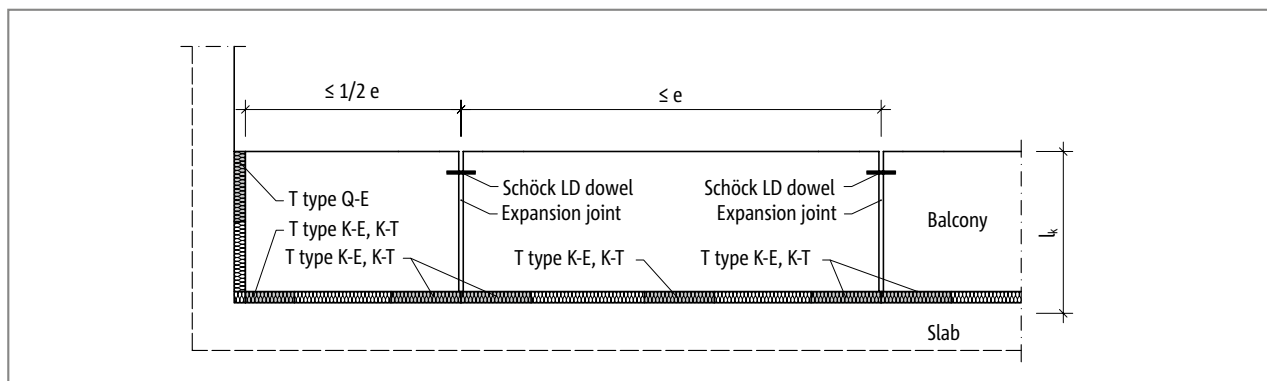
Schöck Isokorb® T type K-E, K-T: Expansion joint spacing
